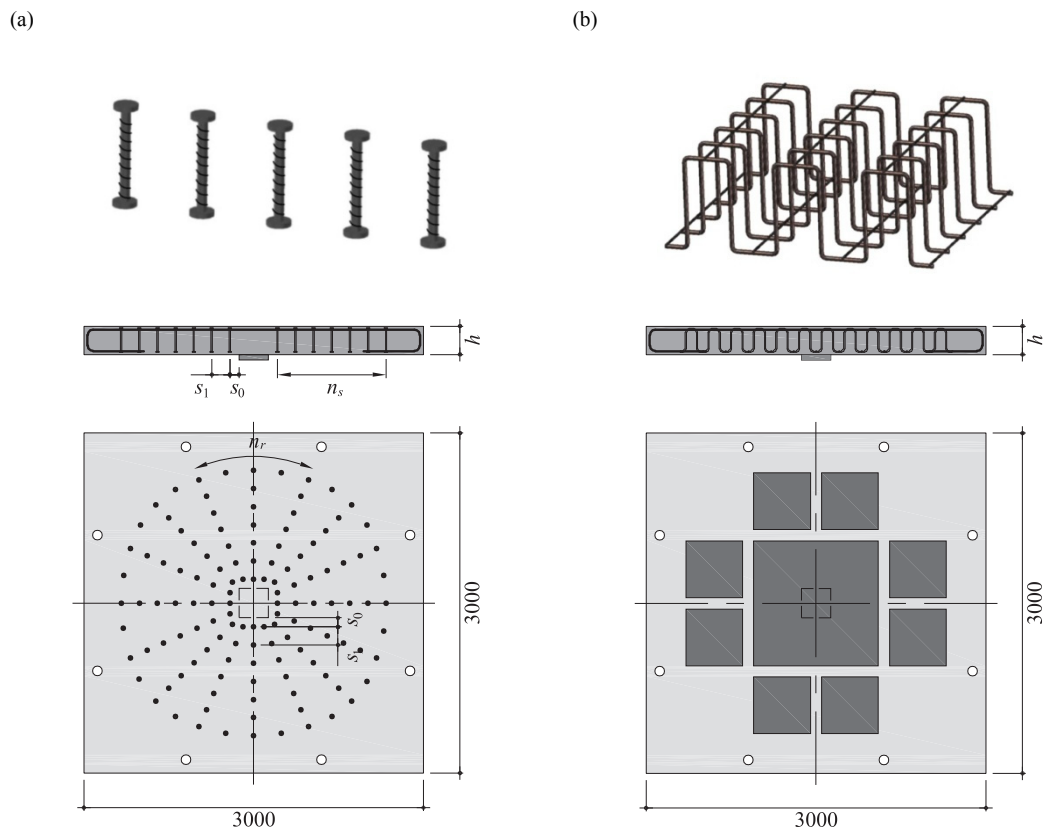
Shear reinforcement used and their distribution: (a) corrugated studs and (b) cages of continuous stirrups (dimensions in mm)
